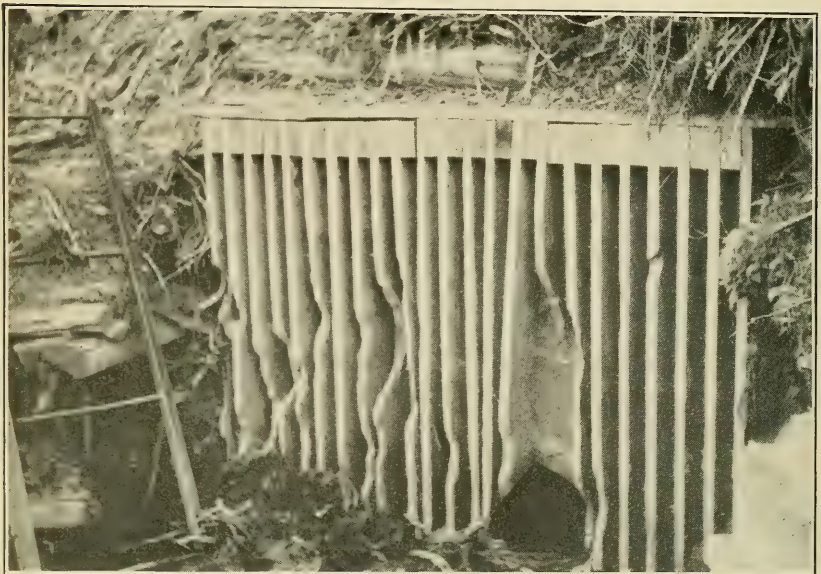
RAILROAD CULVERT SCREEN CUT BY BEAVERS.
